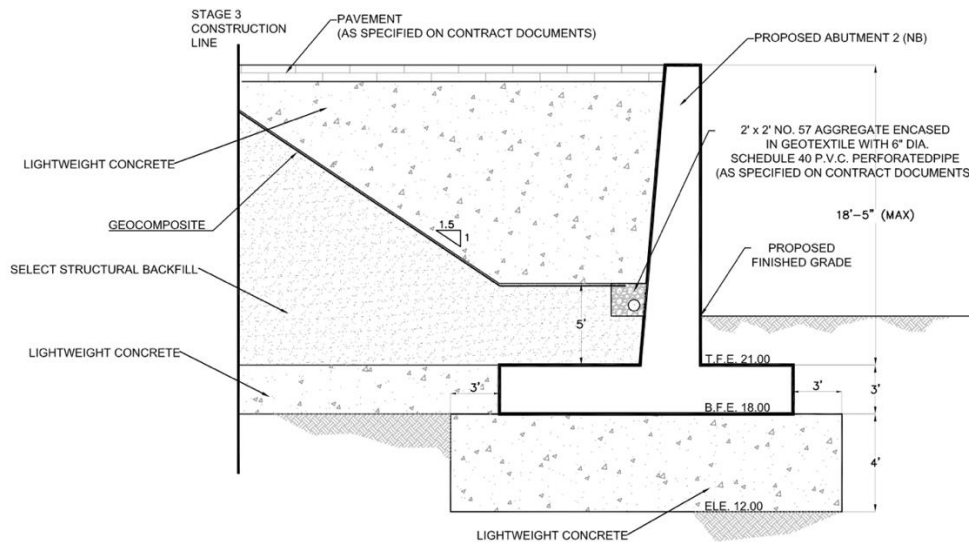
Typical cross section for Abutment 2 (NB) (0095 Over Marlborough Street, S-26901).
